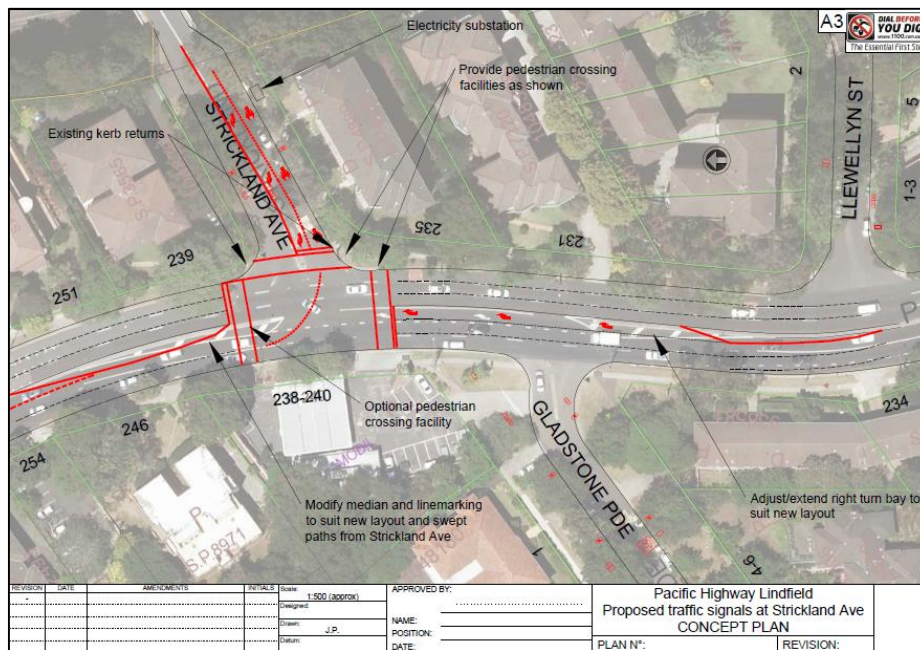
Proposed Strickland Avenue Concept Plan, with right turns
